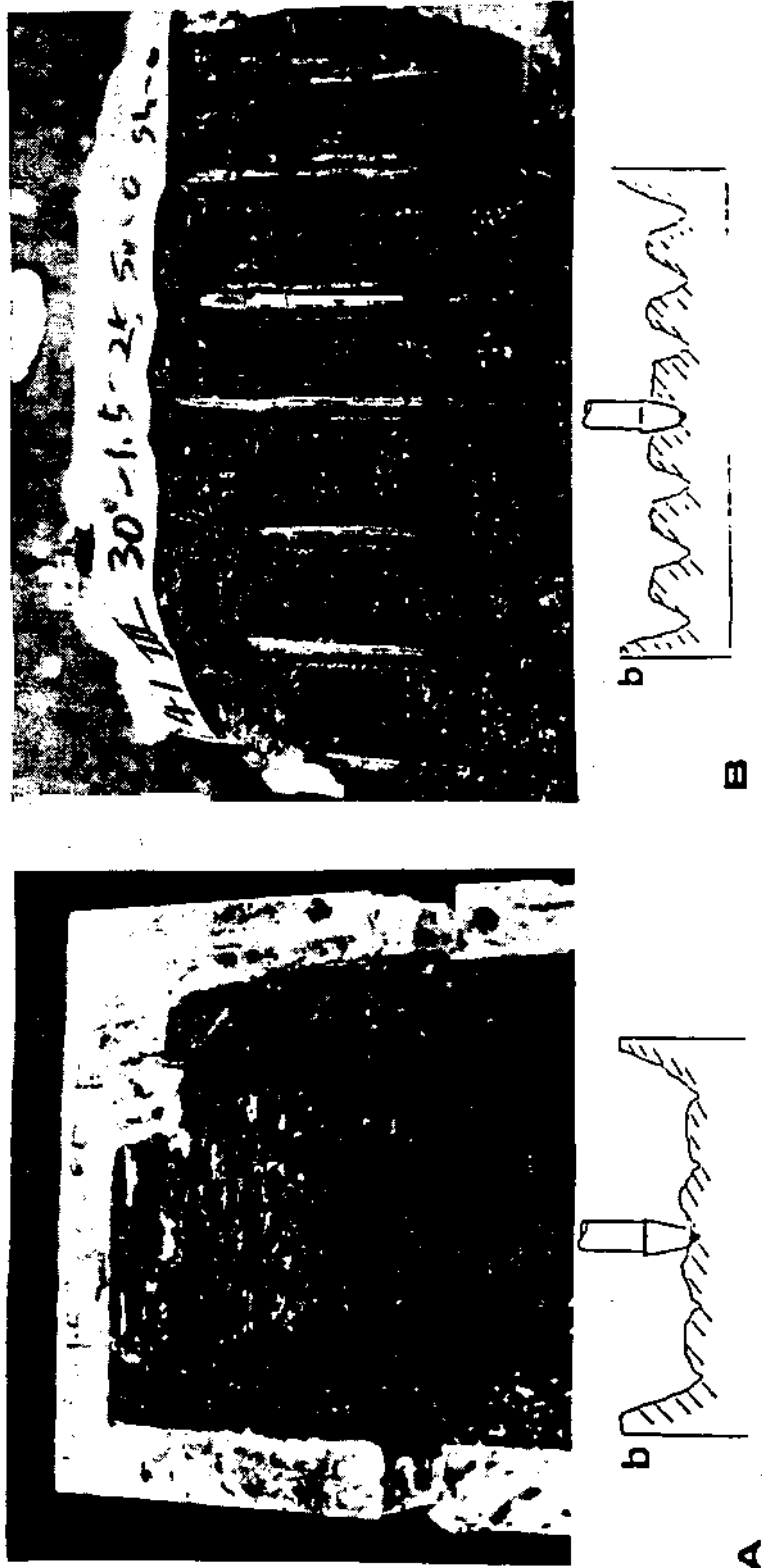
Illustrates two types of fractured surfaces: A - Case 1, B - Case 2 (a - photographs of typical test representing each case, b - general cross-section corresponding to each case).
